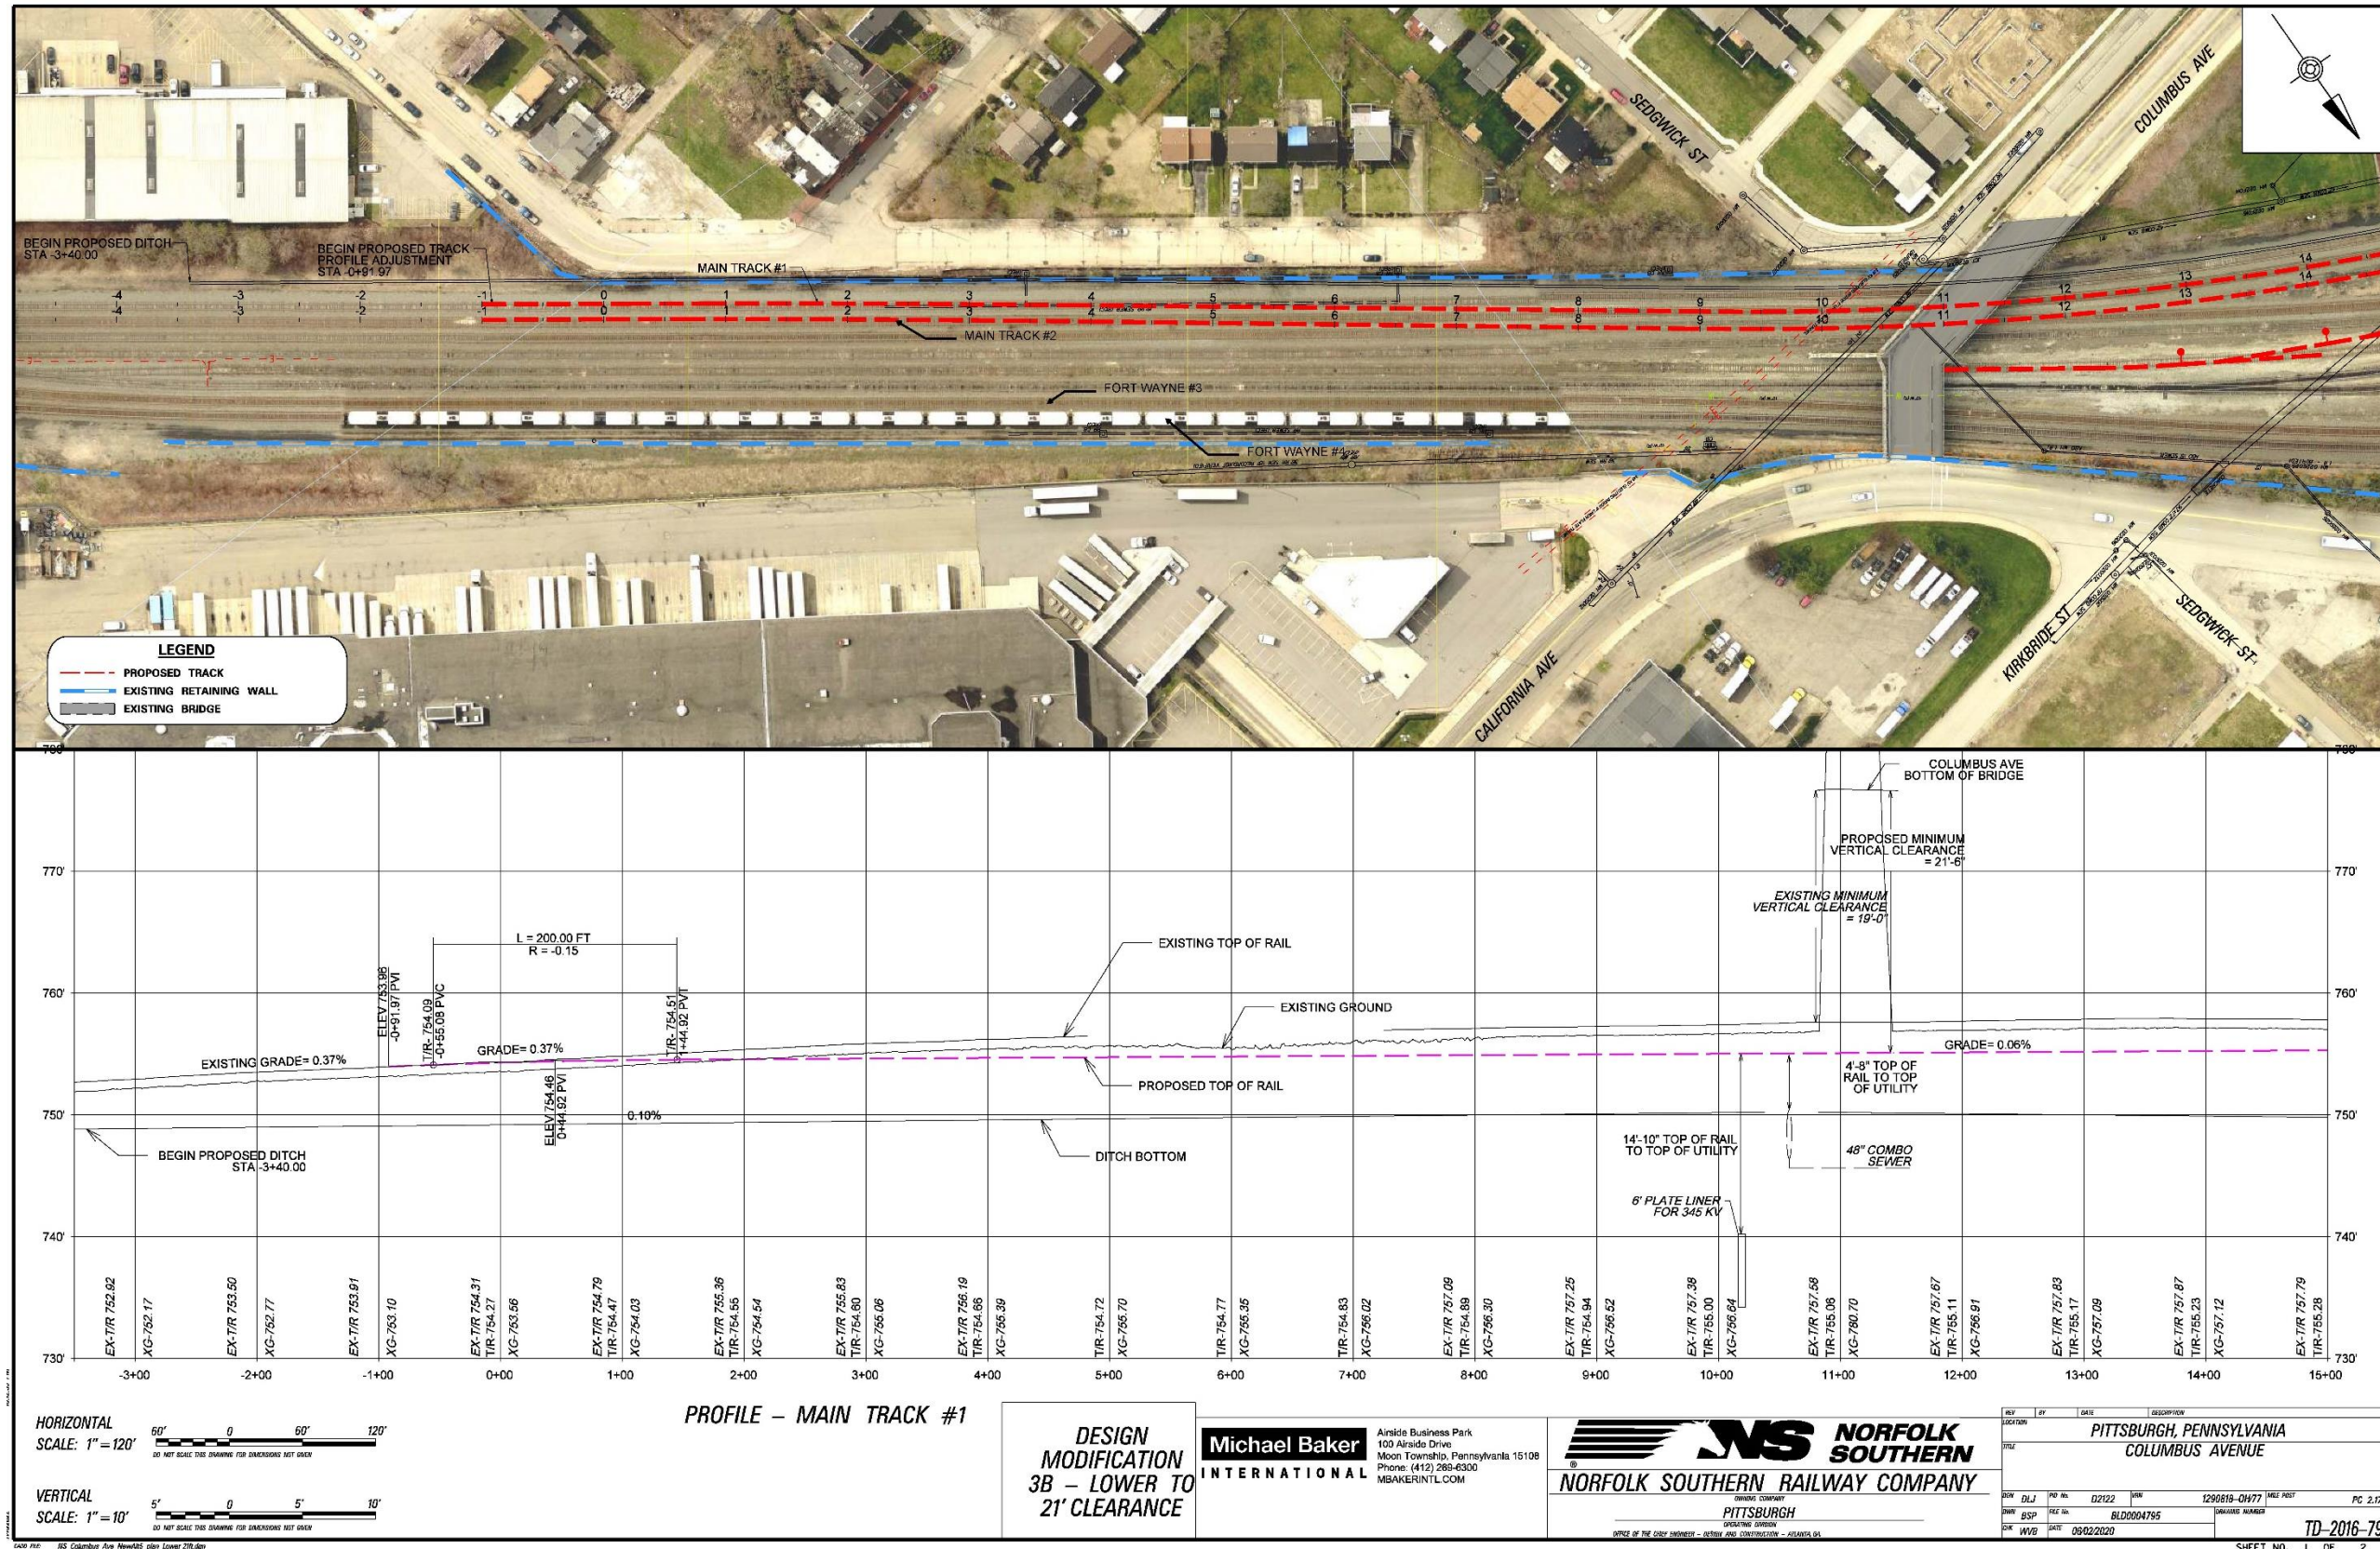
Plan and profile views of Alternative 3B showing area north of the bridge.
